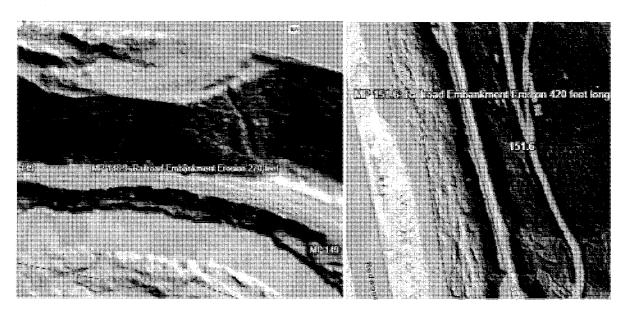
LiDAR image MP 148.9 erosion at Outlet Creek
